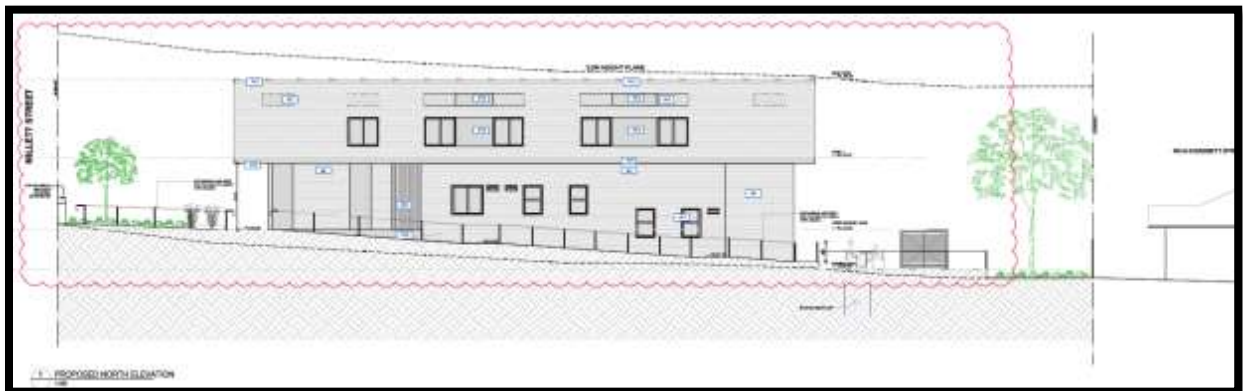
North west (side) Elevation at 5 Millett Street Hurstville (Source – Play Co Architects)
